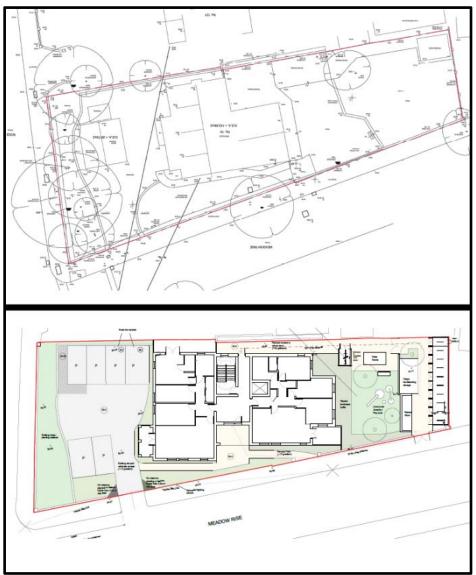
Existing (Top) and Proposed (Bottom) Site Plans.
